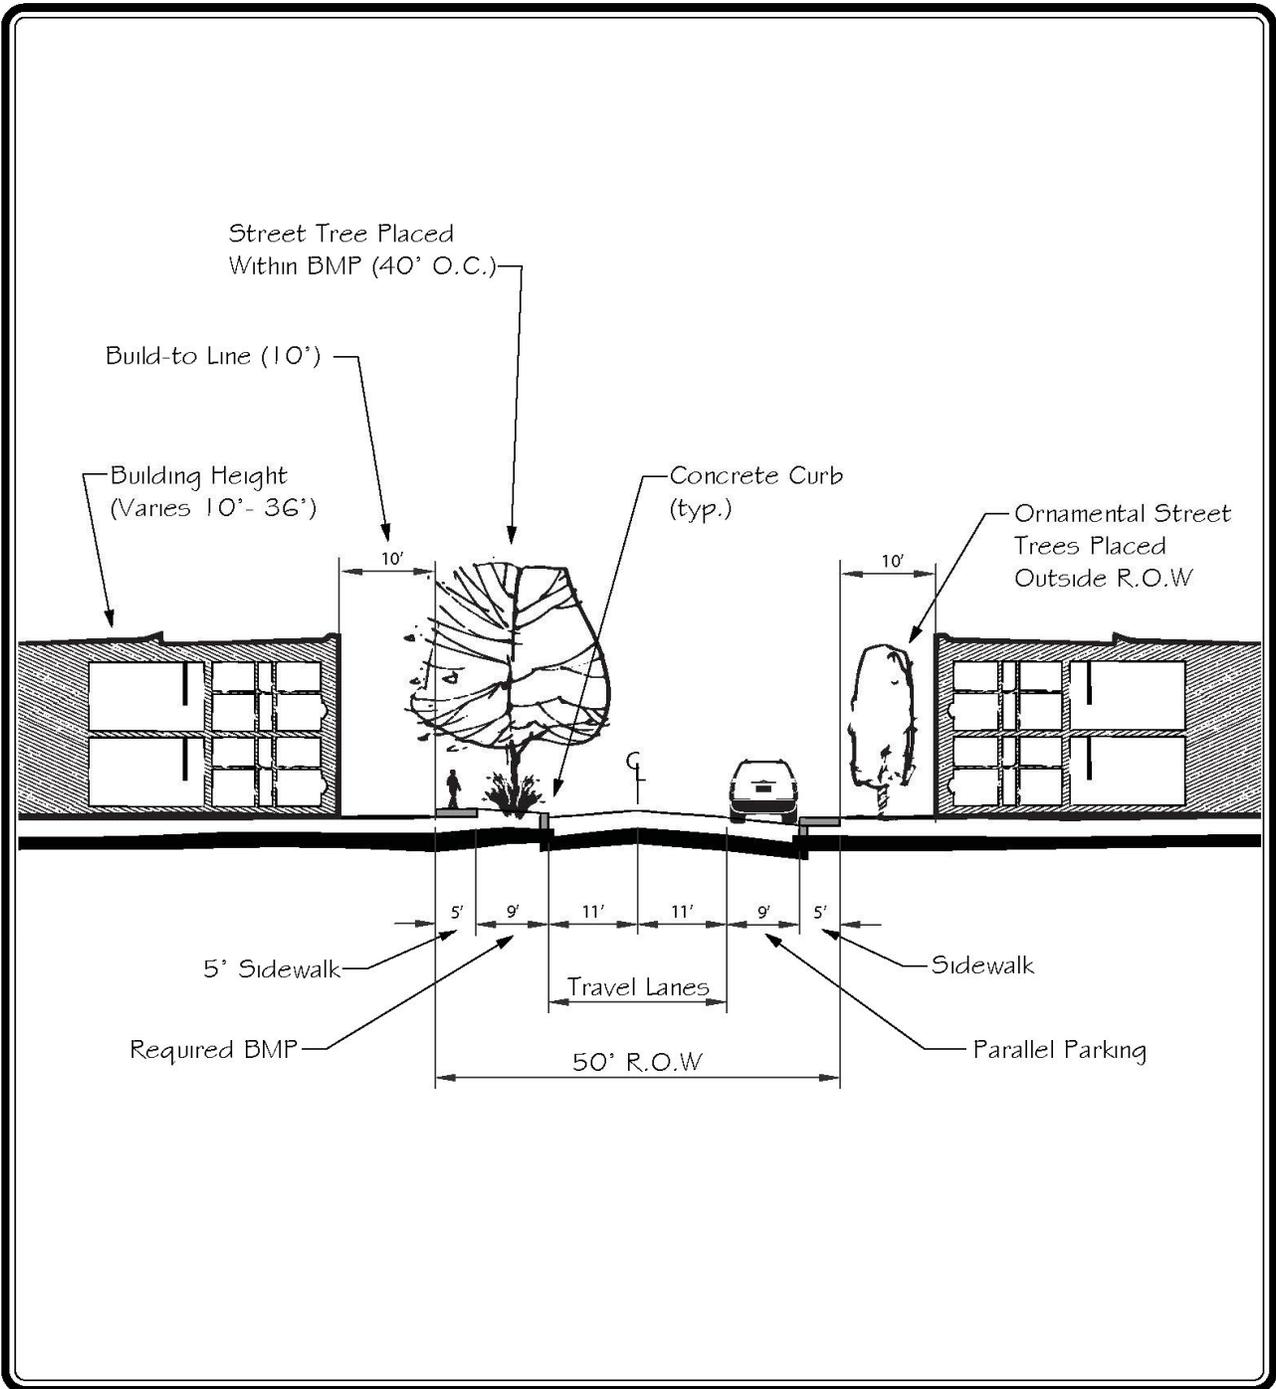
SECTION 314.05 – 05 TYPICAL LOCAL ROAD DETAILS WITH DOUBLE-LOADED PARKING
